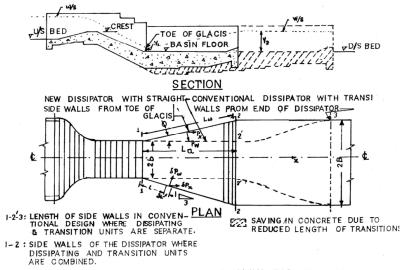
Plan & Sectional View of a Canal Fall Showing Proposed Design (Full Line) and the Conventional Design (in Dotted line)
